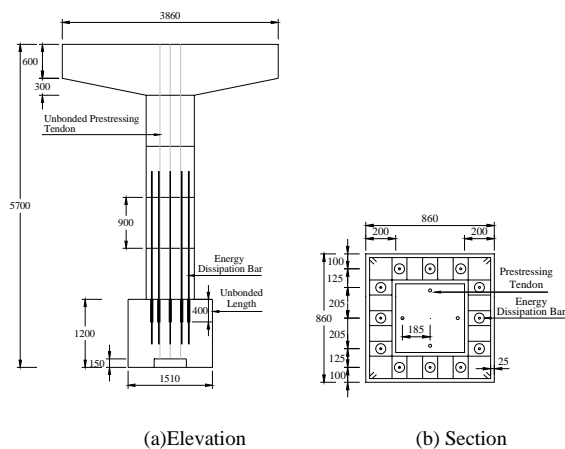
Test specimen elevation and section arrangement (Unit:mm)
